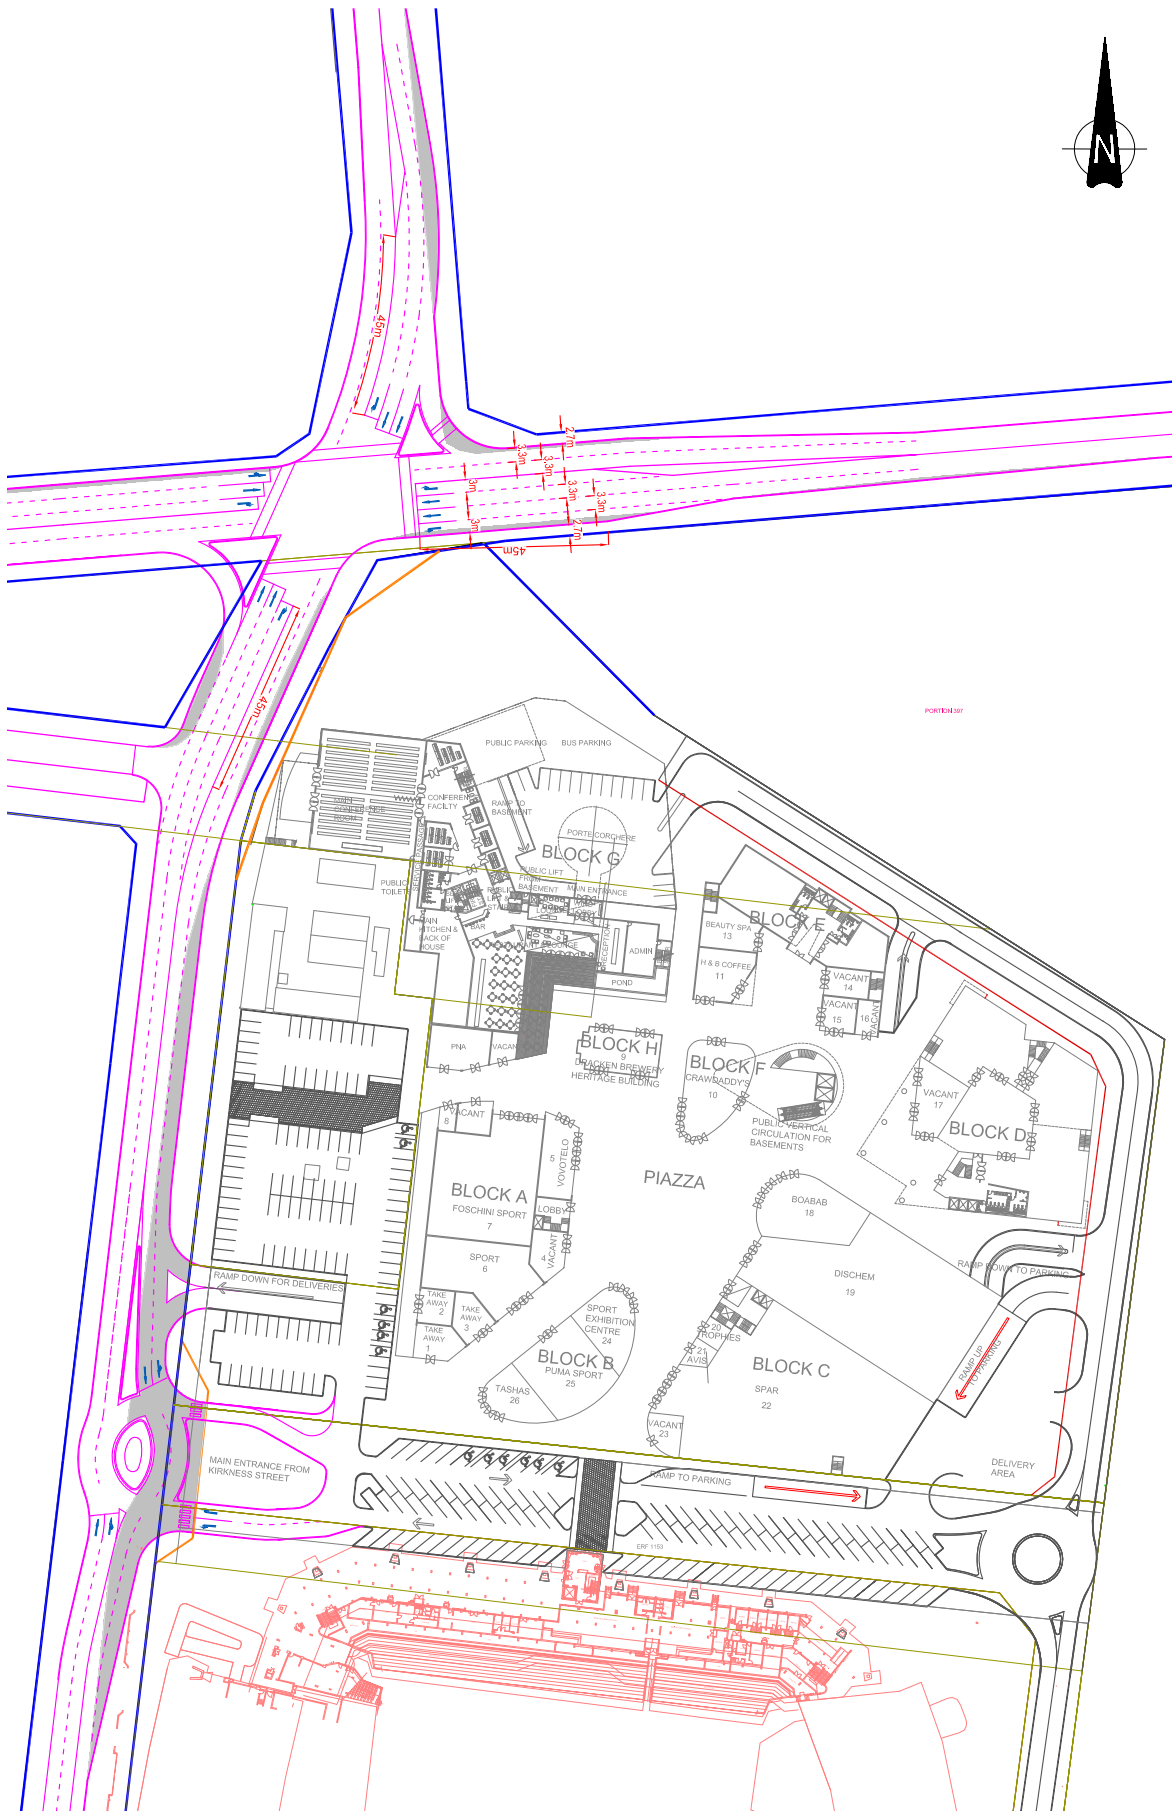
Proposed Roads upgrade for the Loftus Park project. Areas in grey indicate road widening of existing public roads.
